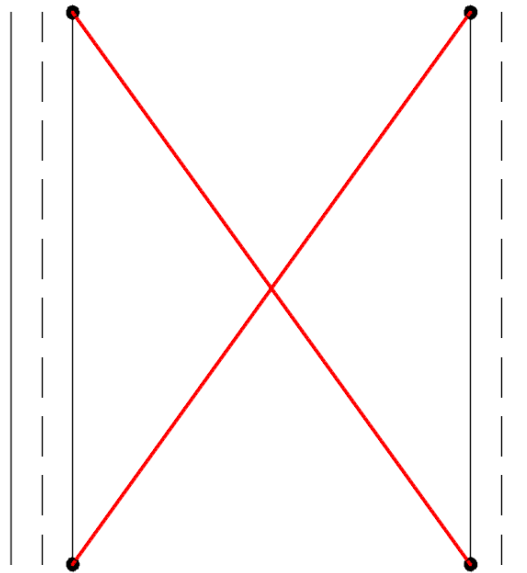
Lateral bracing (either between adjacent plate girders or on tub girders)
